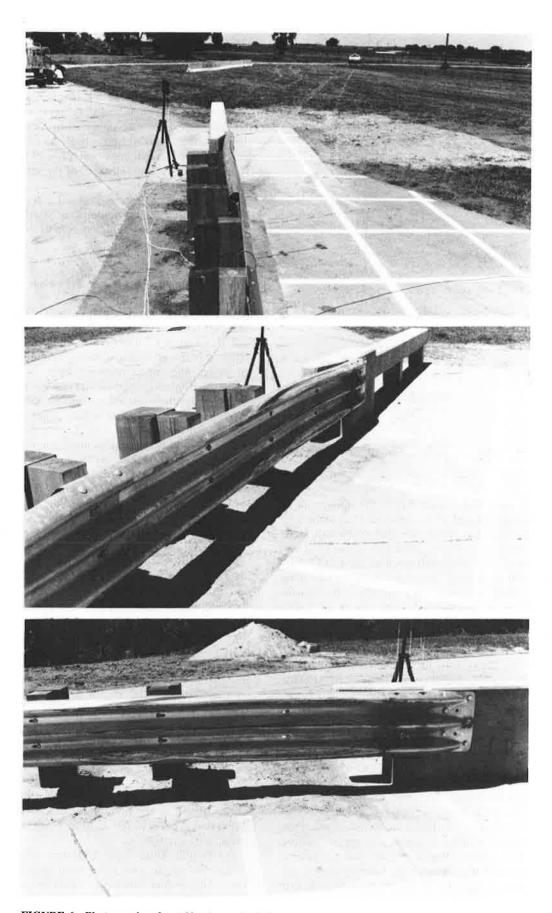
Photographs of test No. 1 guardrail damage.
